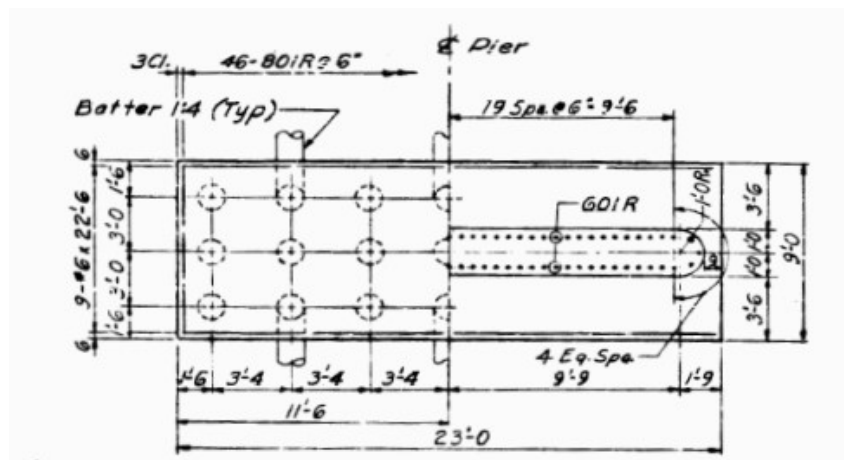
System C: Cross Section of Pier 13 of the Bridge (NBI 33420) (1986)
